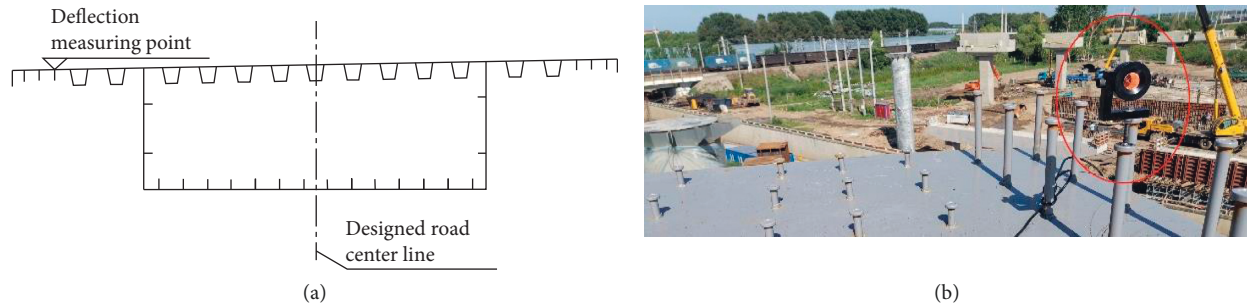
Cross-sectional layout drawing of the deflection measuring point of the steel box girder. (a) The layout of the cross-sectional survey points. (b) Object picture of measuring-point arrangement.
